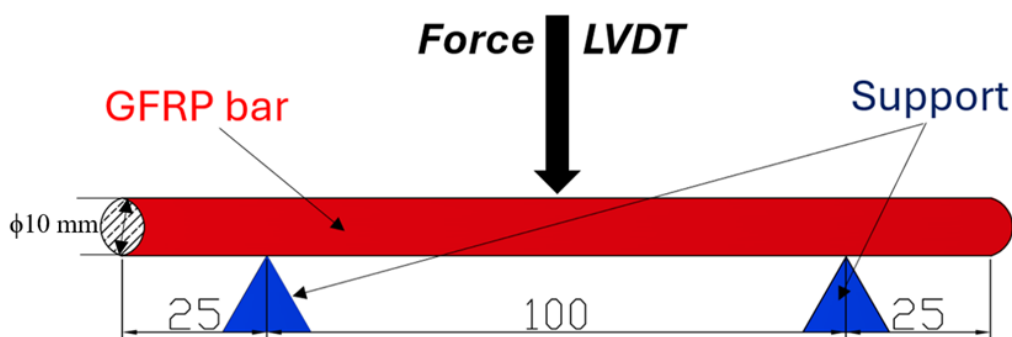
Schematic Three Point Bending test of cylindrical GFRP bar specimen and dimensions
